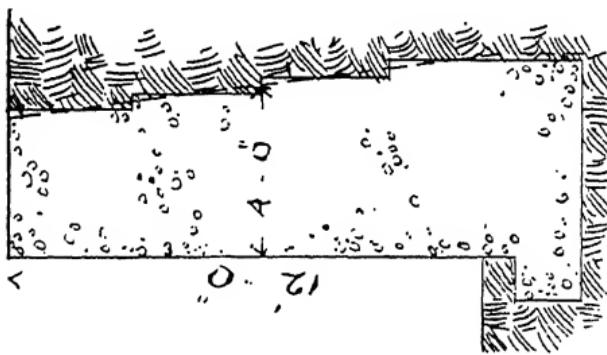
Retaining Wall with vertical Back and Face battered 1 in 8.
